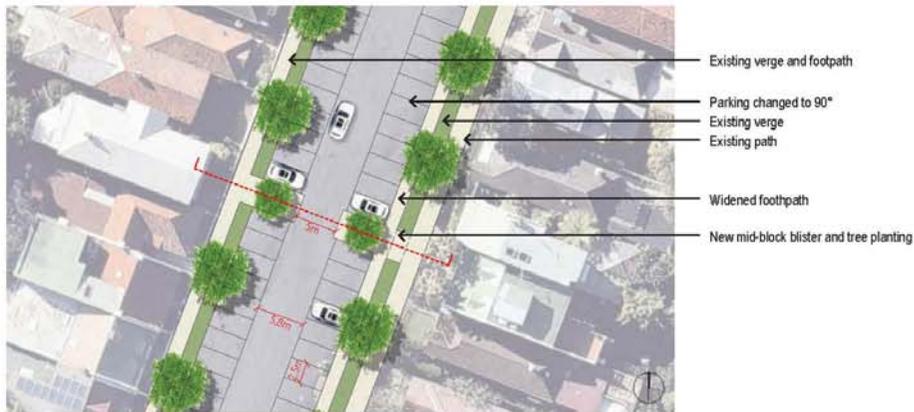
TYPICAL PLAN OF RECONFIGURED ANNANDALE STREET (not to scale)
